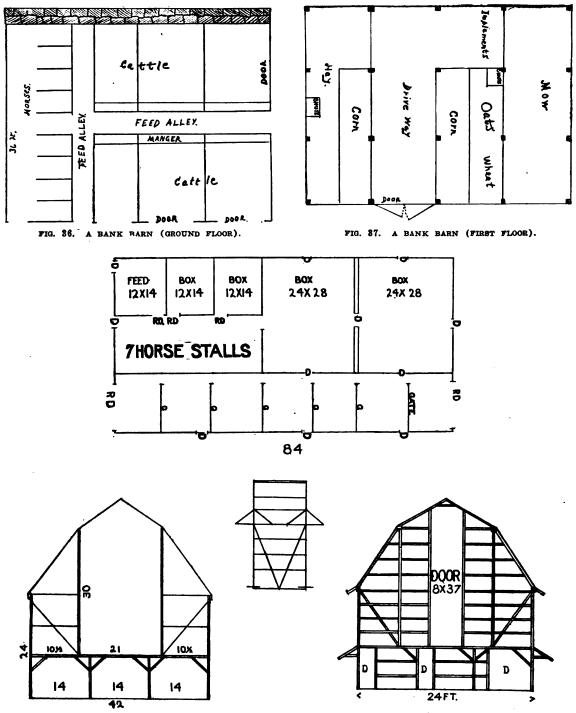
AN OHIO BARN (GROUND PLAN AND CROSS-SECTION).
